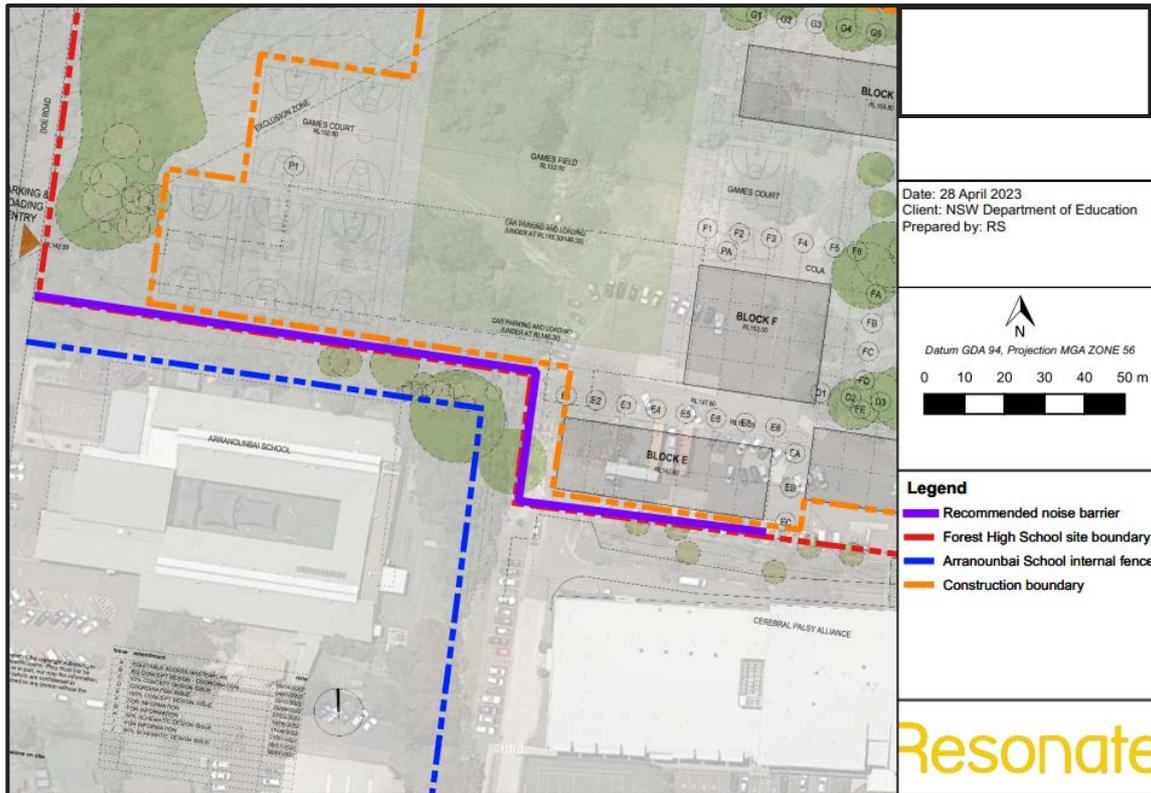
| Noise barrier location during construction (Source: Applicant’s RtS 2023)
